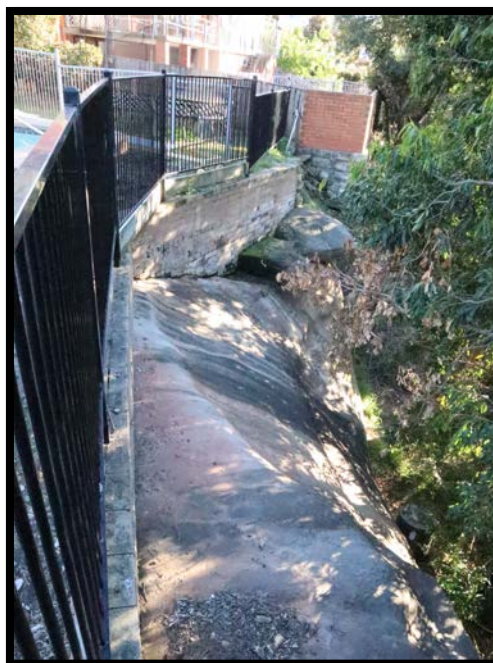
Natural rock wall and pool fence. (*Action Plans 2019*).
